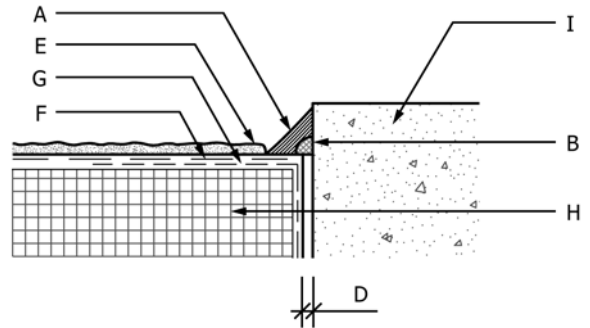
Sealant Fillet Joint Seal With Triangular Sealant Backing
